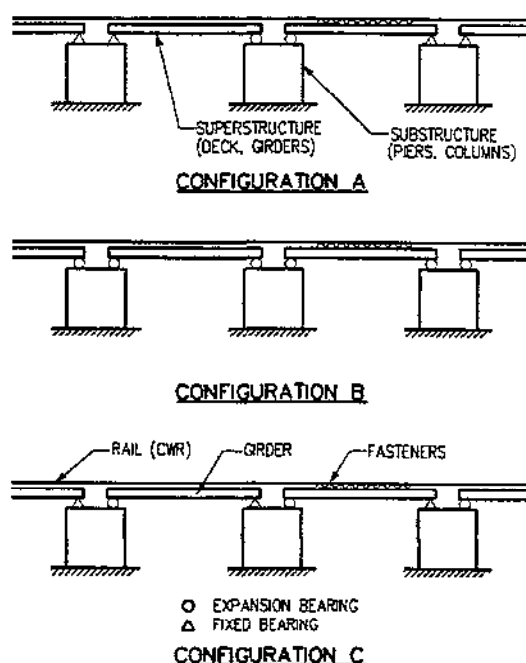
Bearing Configurations for Elevated Structure Girders^[17]
